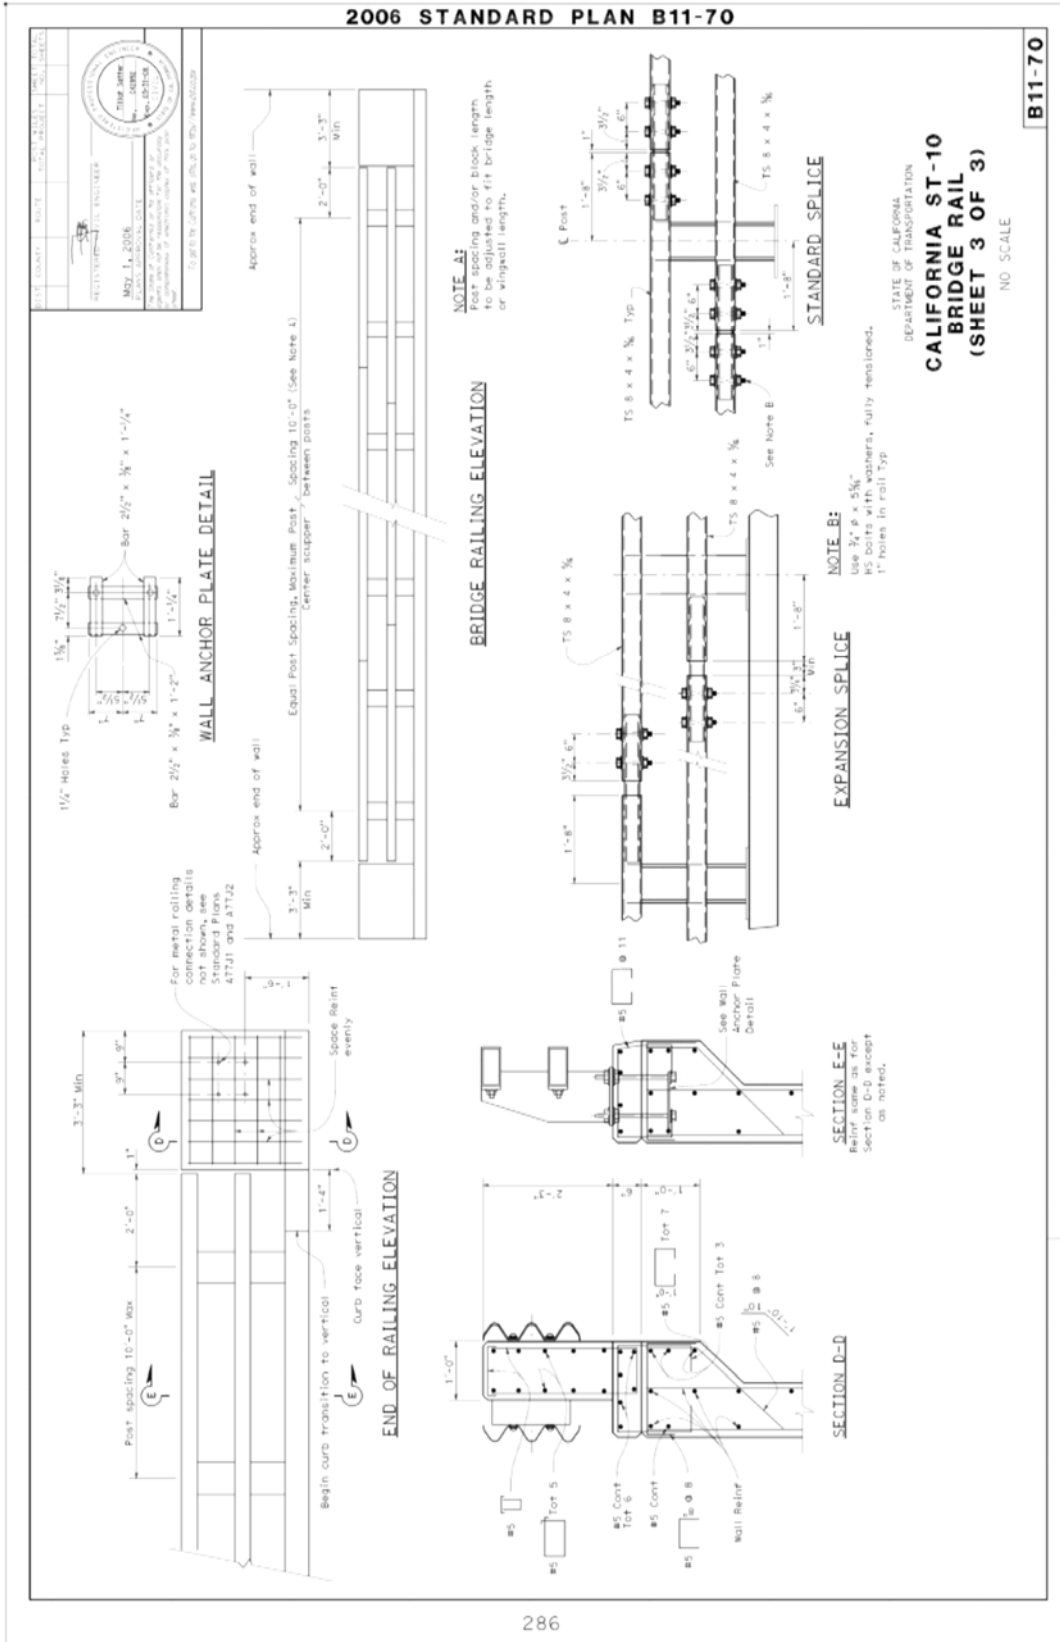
California Standard Plan for the ST-10 Bridge Rail Sheet 3 of 3
